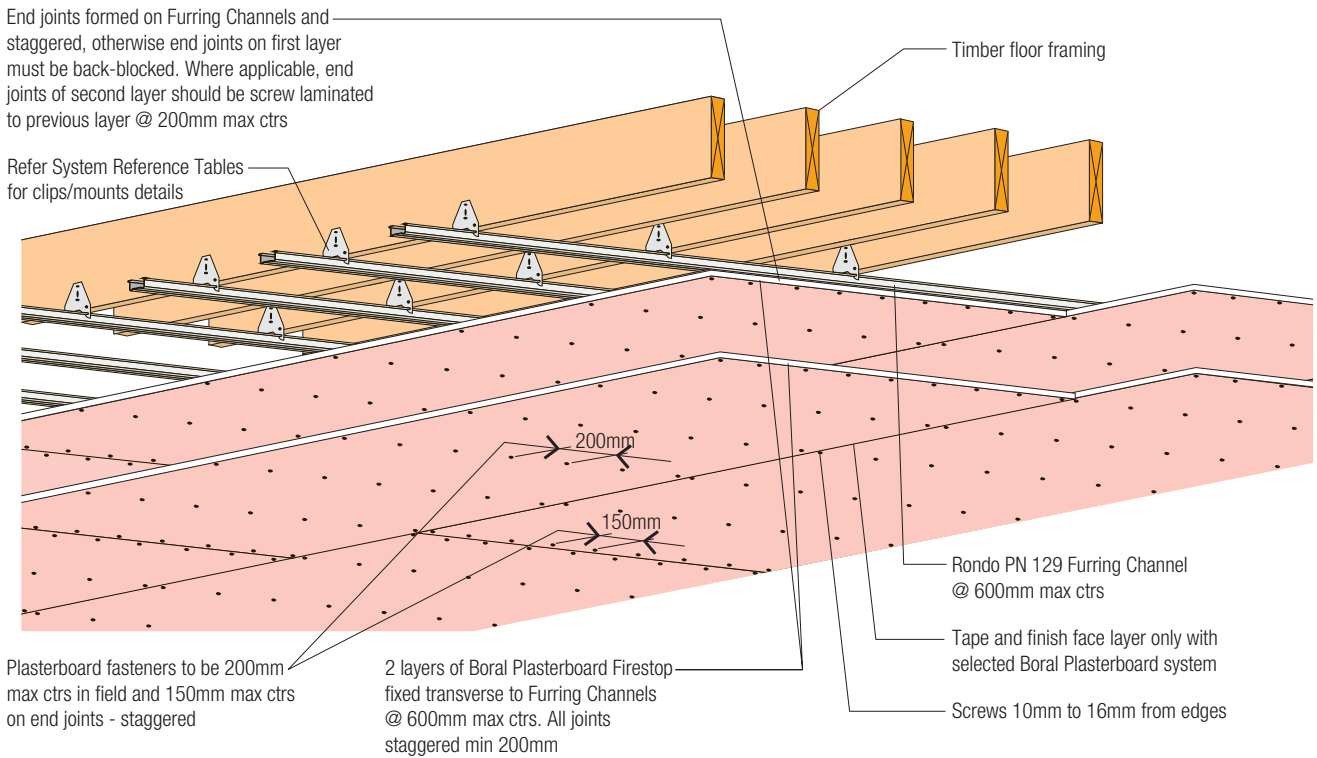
Fire Rated Timber Framed Ceiling – Plasterboard Fixing on Furring Channels
